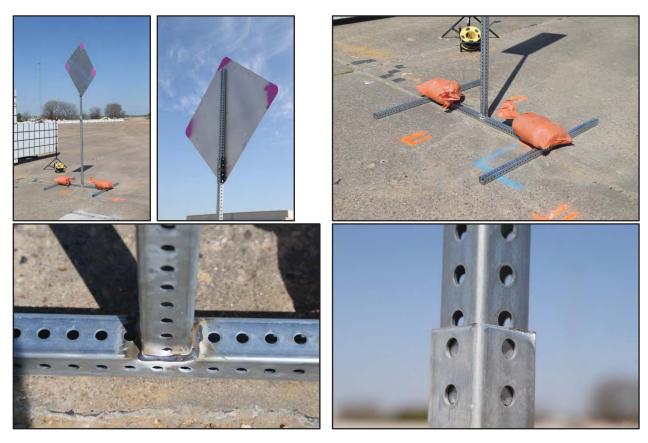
Option B Temporary Work Zone Sign Support Used for Test No. 490026-2-2.
